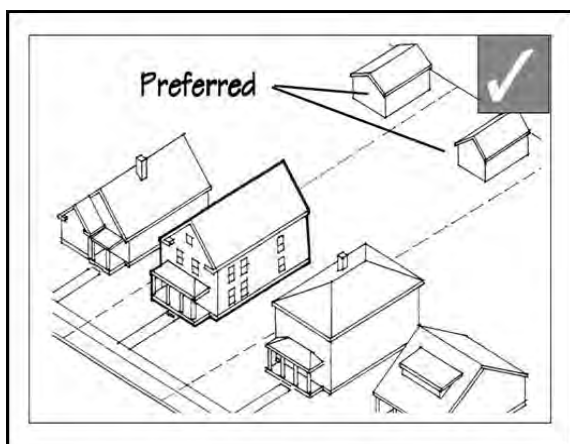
Indicates the preferred location of new secondary structures, which aligns with the build zone of existing secondary structures
